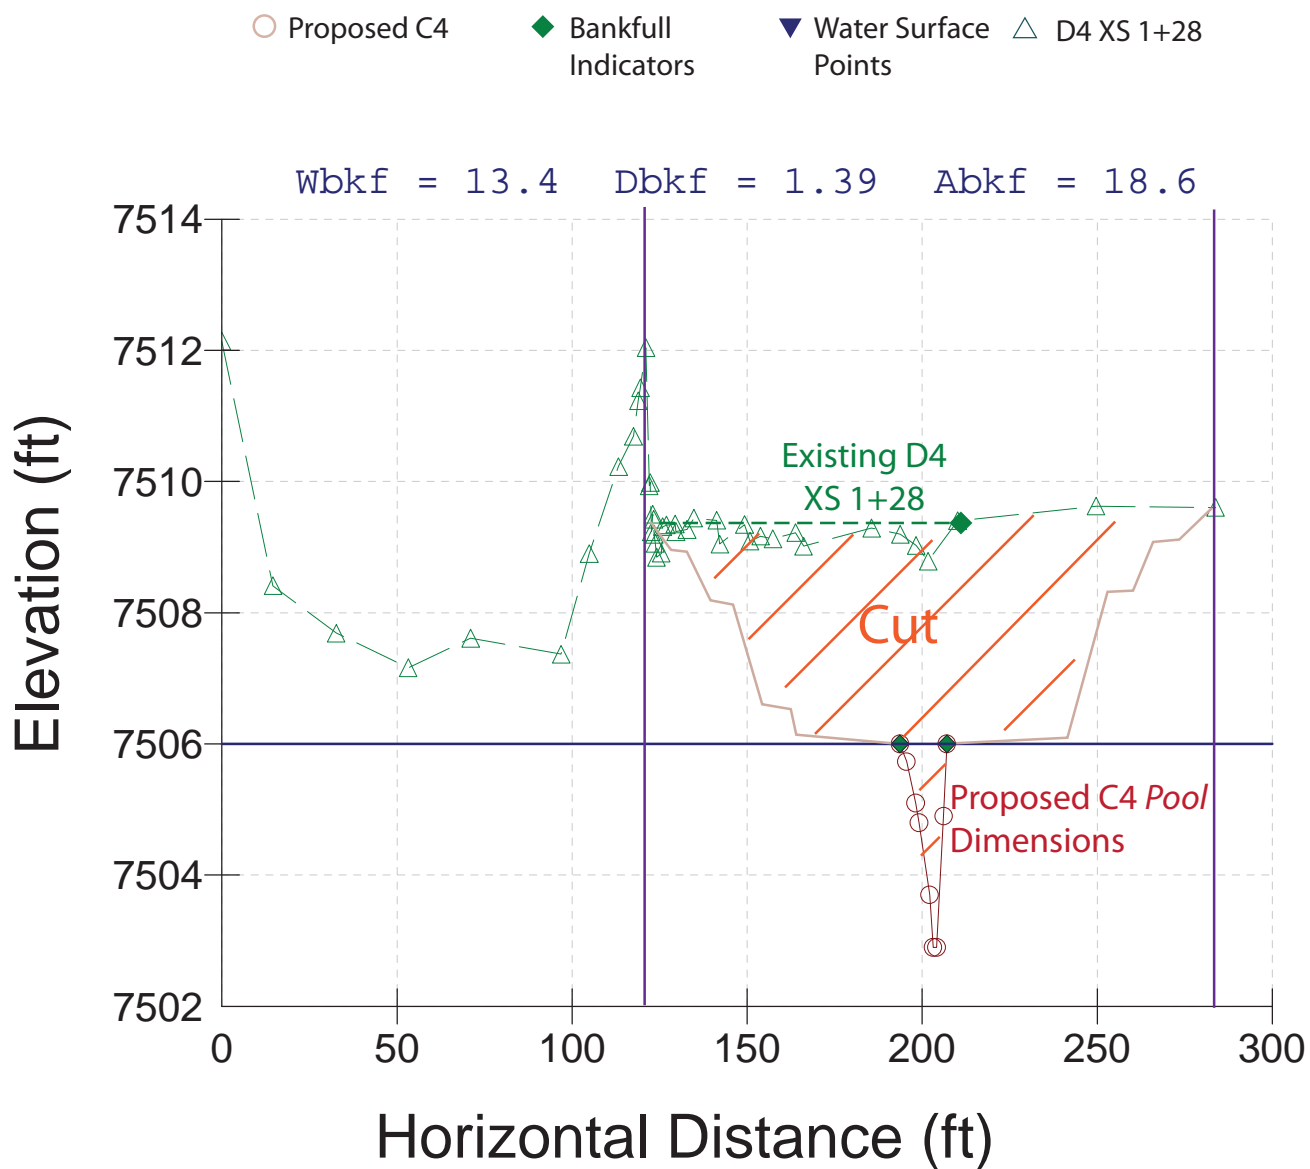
The proposed C4 pool cross-section compared to the existing D4 cross-section 1+28 below the West Creek road.
